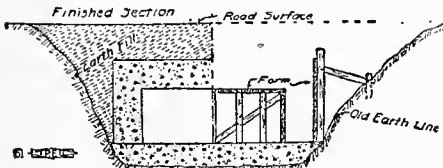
Field Culvert Form—Showing Half Finished and Half with Form in Place.
